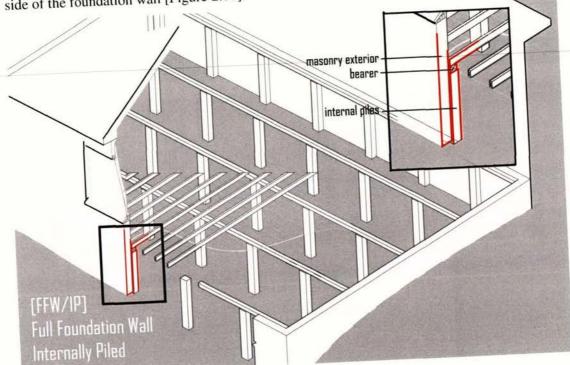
Detail of Full Foundation Wall / Internal Piled Foundation
